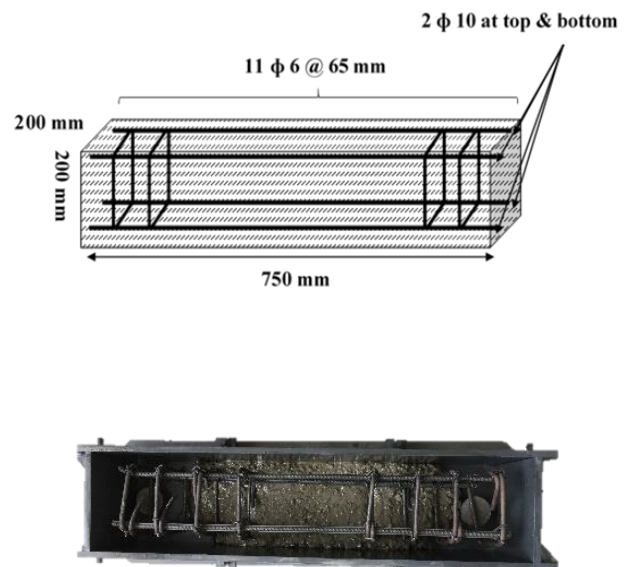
Details of tested beam reinforcement containing transverse and longitudinal reinforcement
